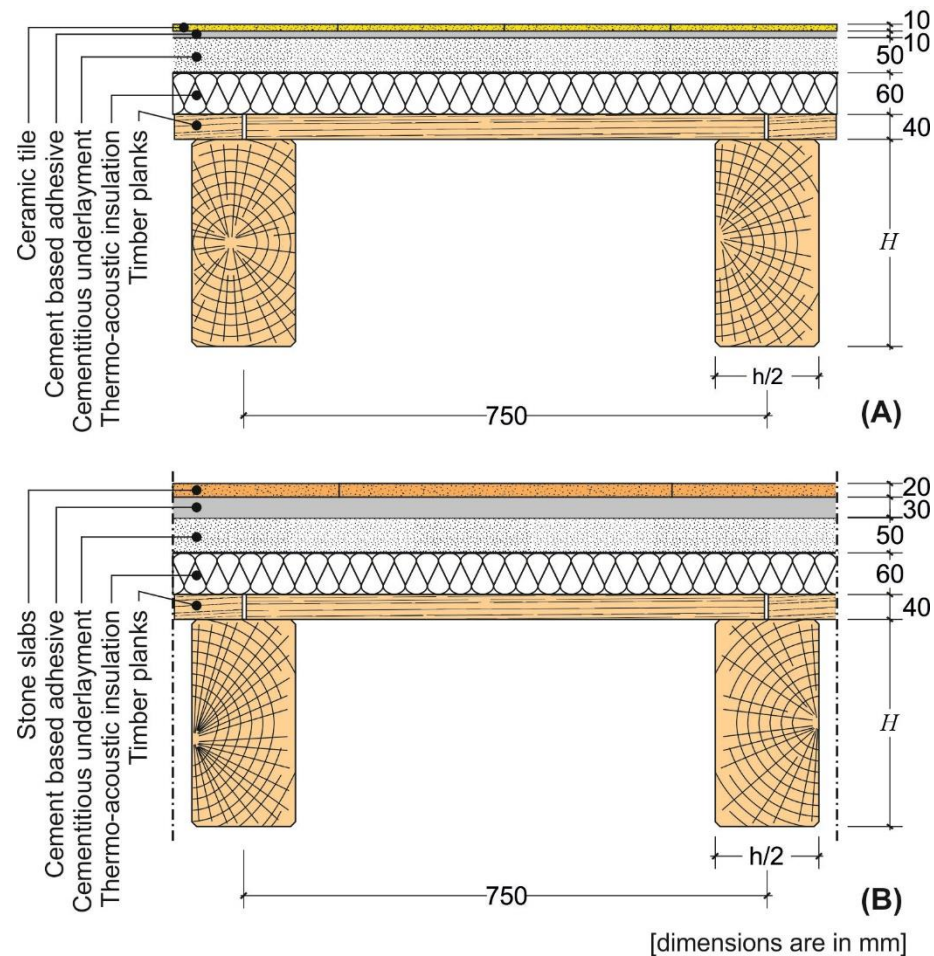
Cross-section of the timber beam and plank slab with (A) ceramic and (B) stone floorings.
